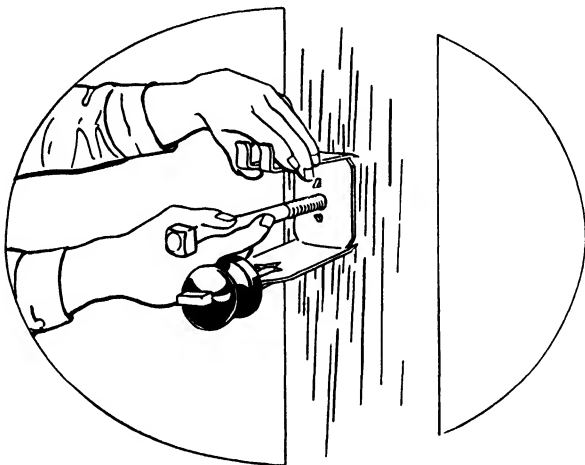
Showing manner of inserting through bolt used to fasten Sagger bracket to pole. (Courtesy Hubbard & Co.)
